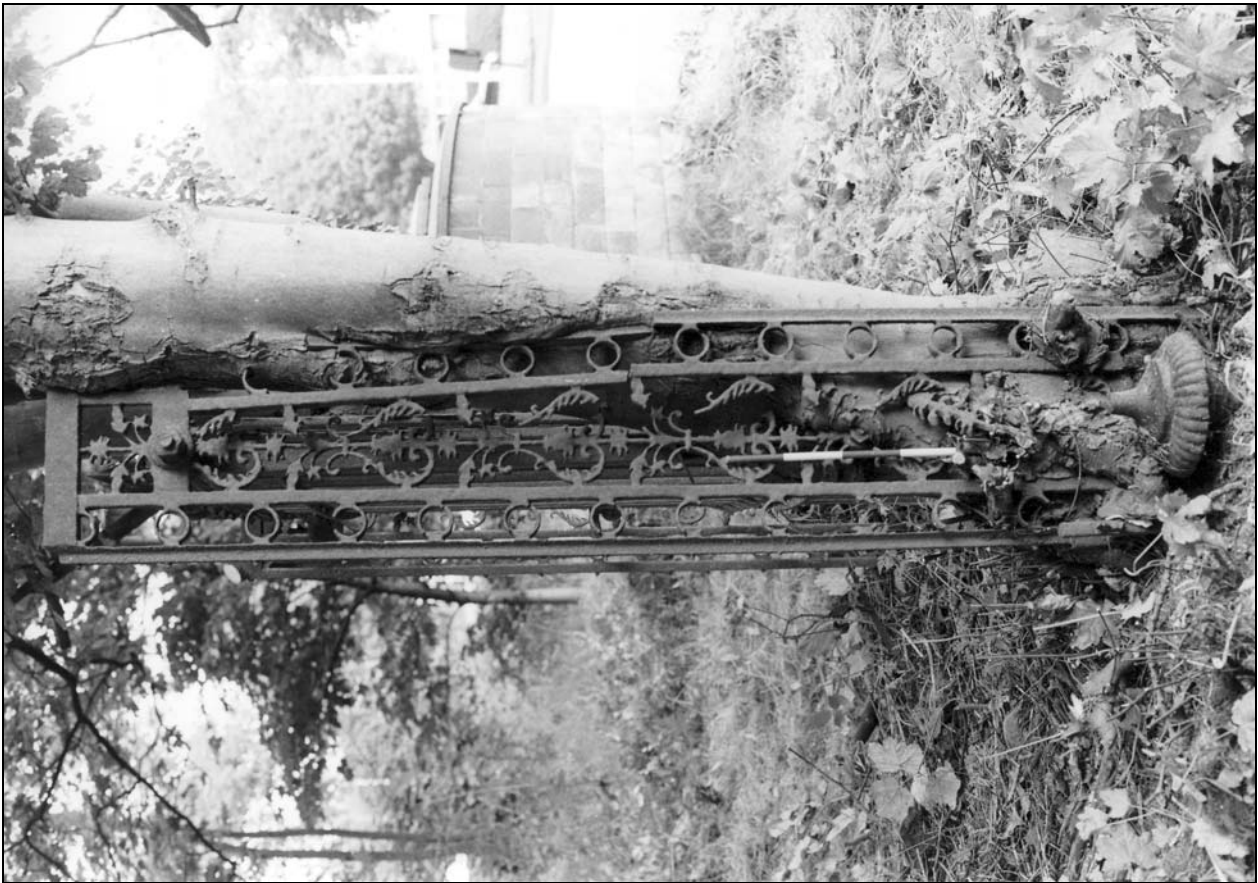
Cross panel to south of gate, looking north (film 2, frame 4)
